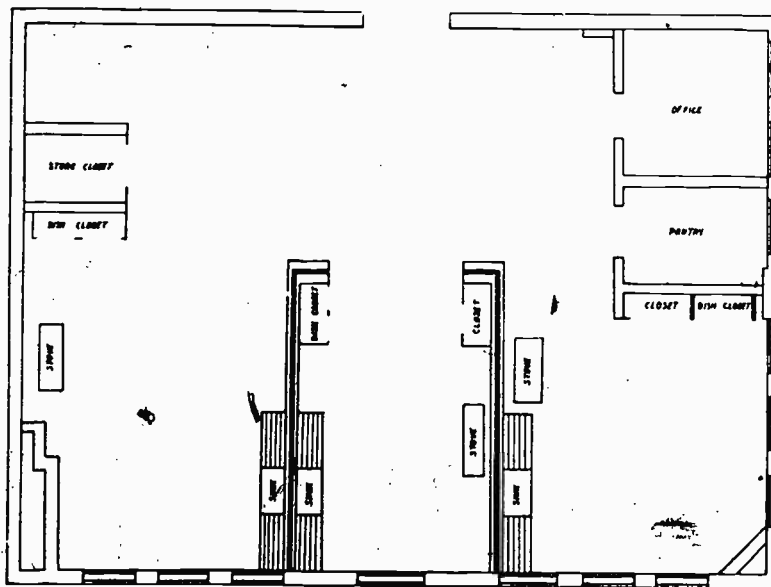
School No. 2. Floor plans of unit kitchens.
